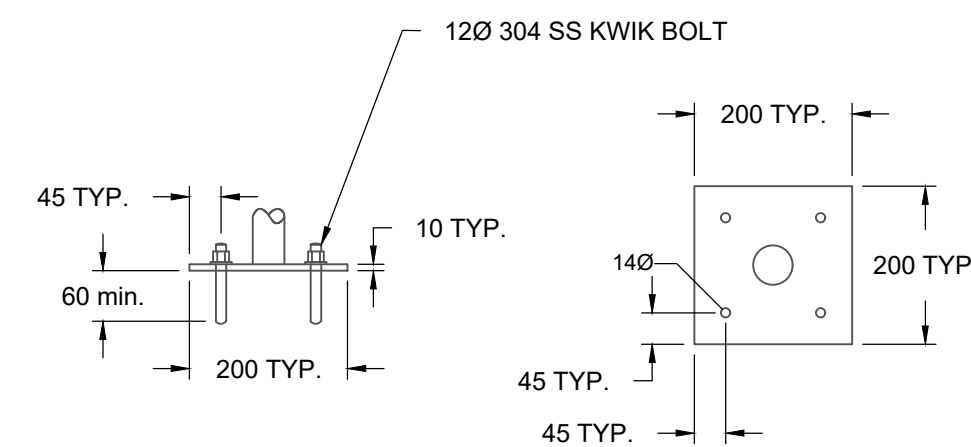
BIN PAD - STRUCTURAL DETAIL
